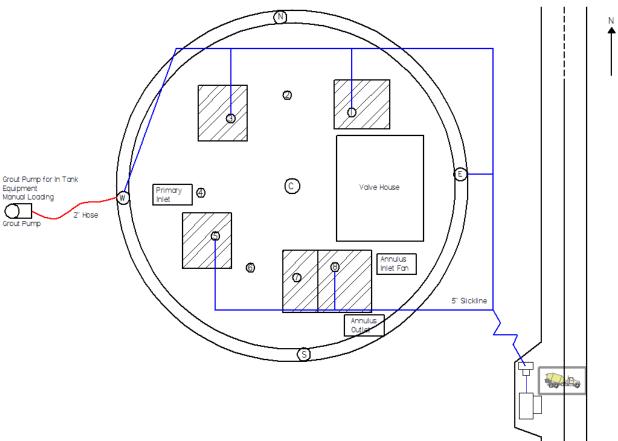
Tank 12H Typical Grout Equipment Layout
